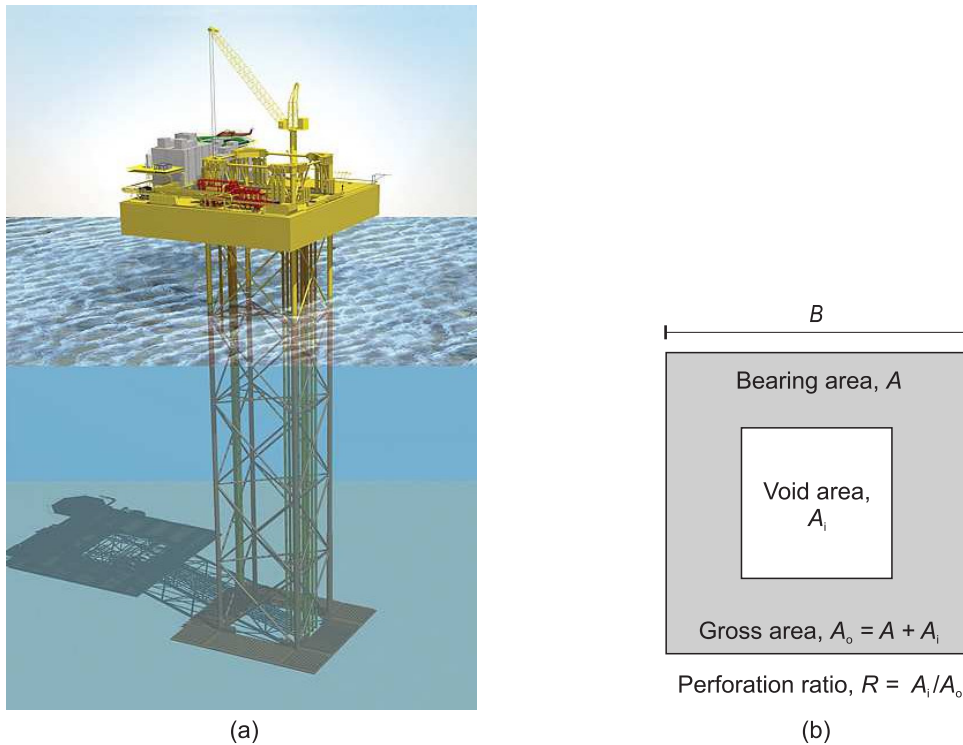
Perforated foundations: (a) the Maari wellhead platform, supported on a gravity base foundation with a central perforation (Arup, 2009); (b) plan view of foundation showing definition of perforation ratio, R
